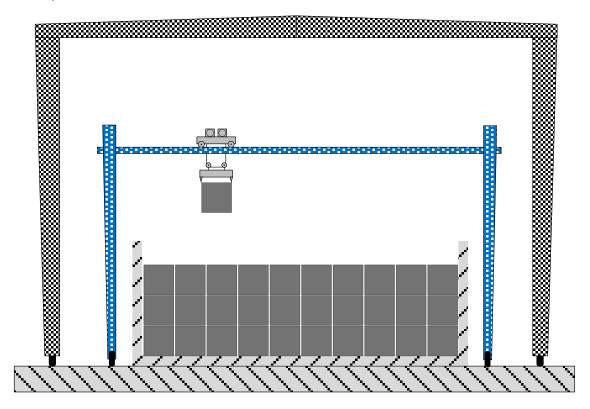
Disposal technology in single unit of LILW repository -- side view
